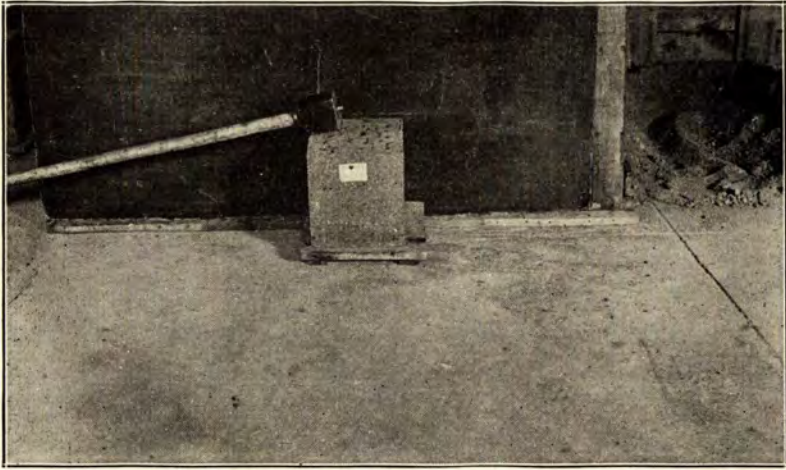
A NUB-RAMMER USED IN AN EXPERIMENTAL ATTEMPT TO SECURE A BETTER BOND BETWEEN THE LAYERS OF EARTH IN A RAMMED EARTH WALL.
